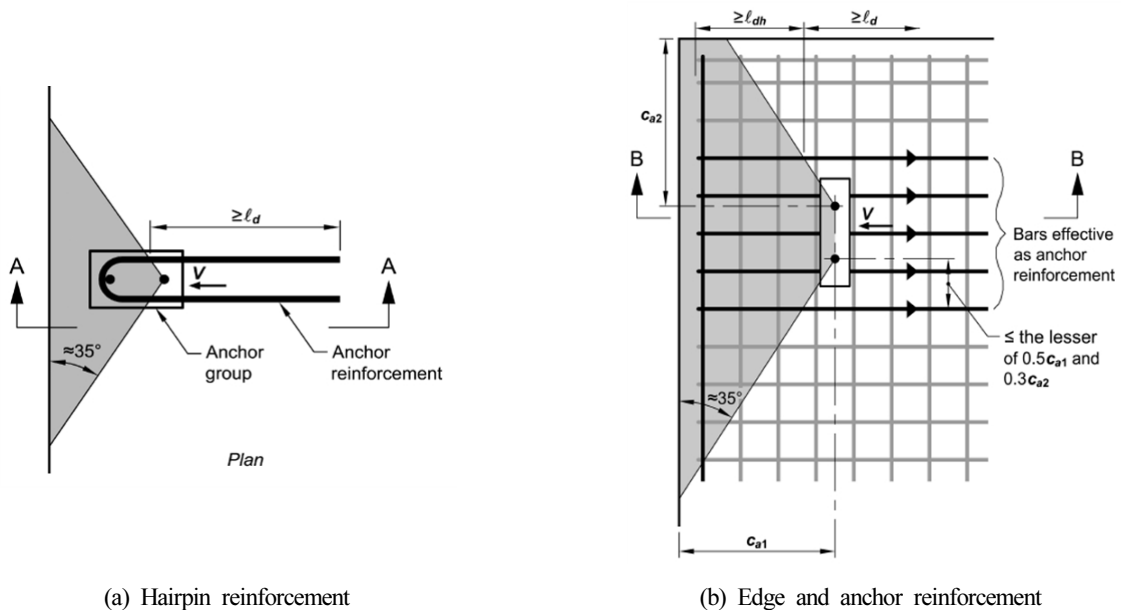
Types of anchor reinforcement^[7] (Plan view)
